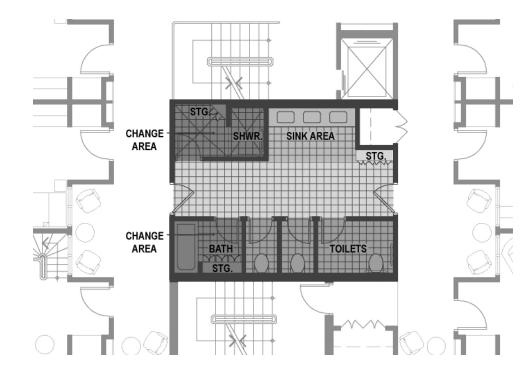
Detail of Washroom Plan of Group Home (Second Floor).
